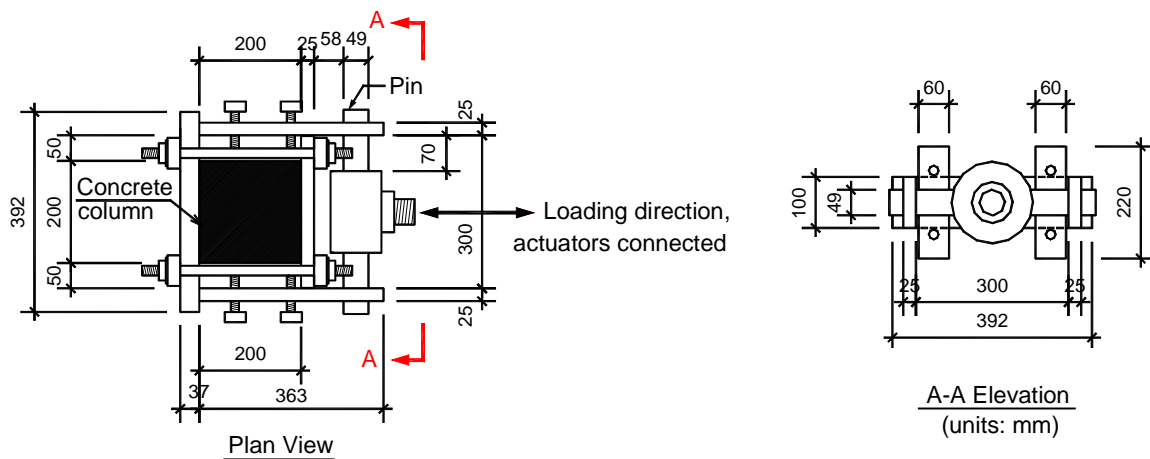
Steel collar system connected to horizontal hydraulic actuators
